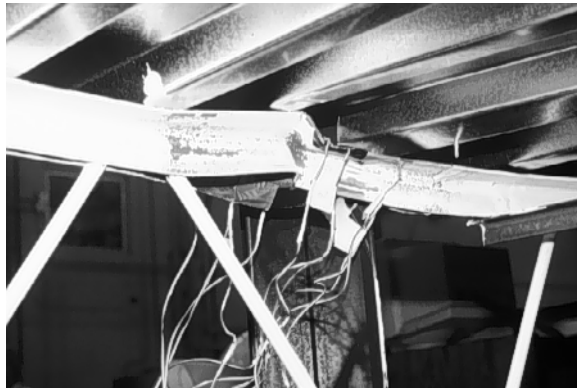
Failure Mode for 16K2-PW-2 West Joist
